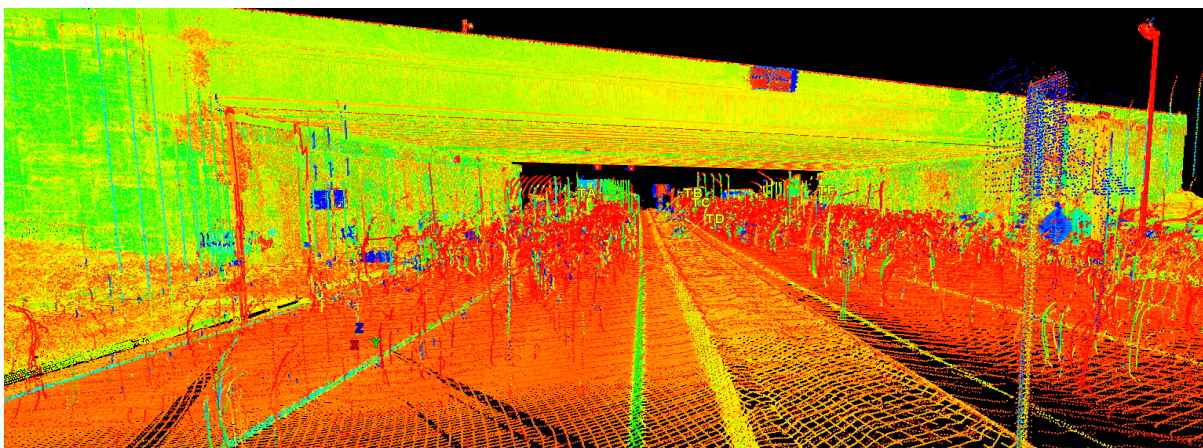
Photo. VA LiDAR point cloud of Epoch 1 for MSE walls at B4 – King George
